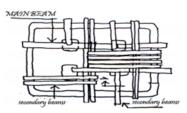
Looking up view of the palm trunks' roof with reference to the layout of the main and secondary
